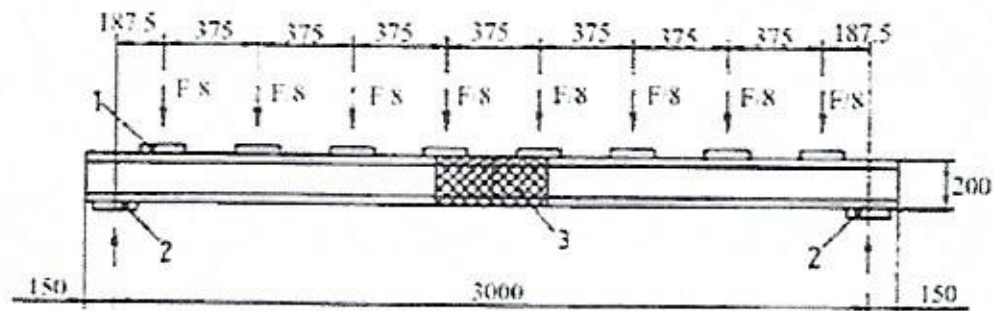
Beam Test Configuration according to Annex A to the EN 13377
